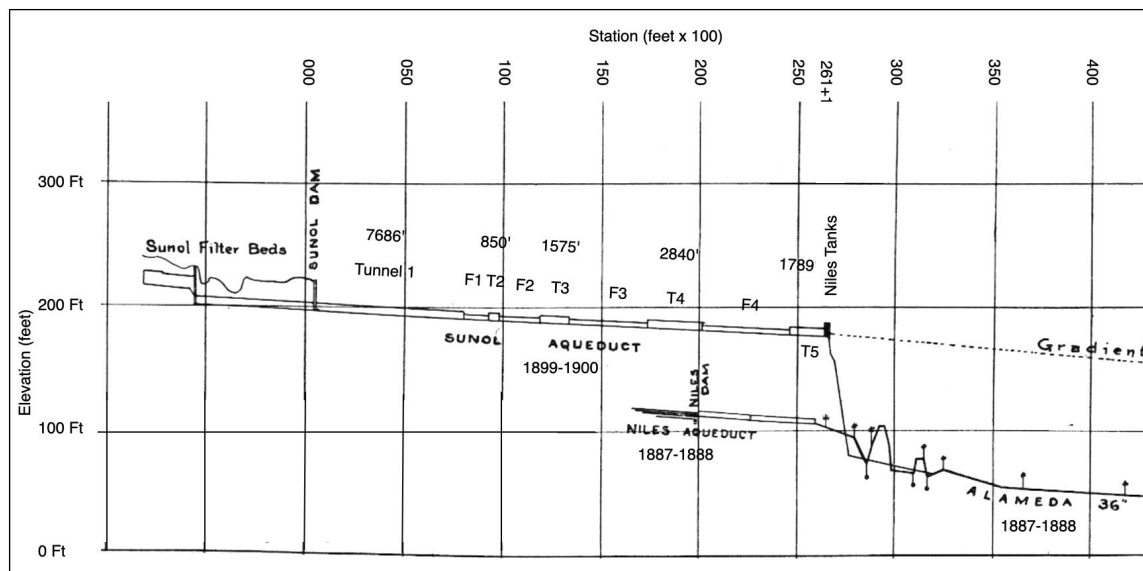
Sunol Aqueduct and Niles Aqueduct Hydraulic Profile (SVWC drawing)
